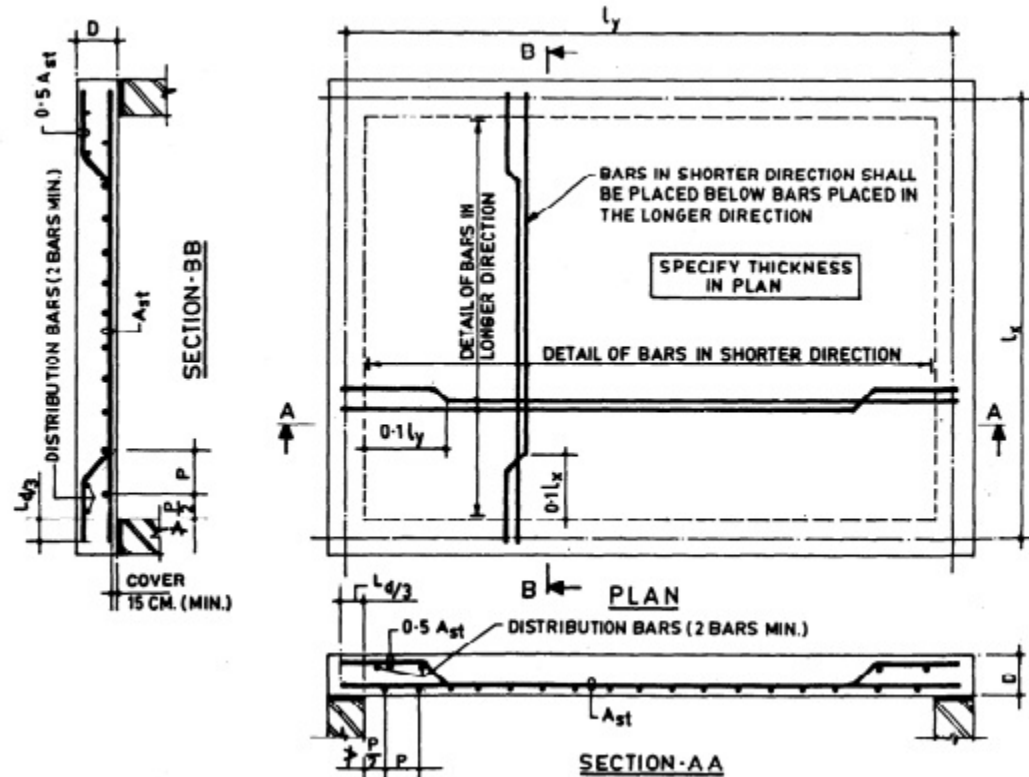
typical detail of simply supported slab resting on wall spanning in both direction
